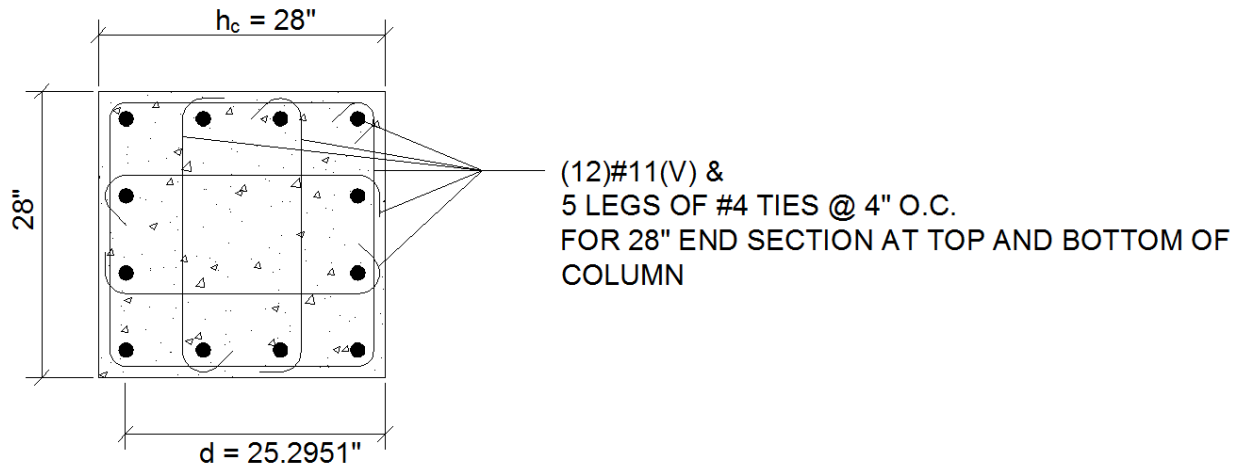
Exterior column, cross-section at end section of column at ground floor level based on tsunami design requirements.
